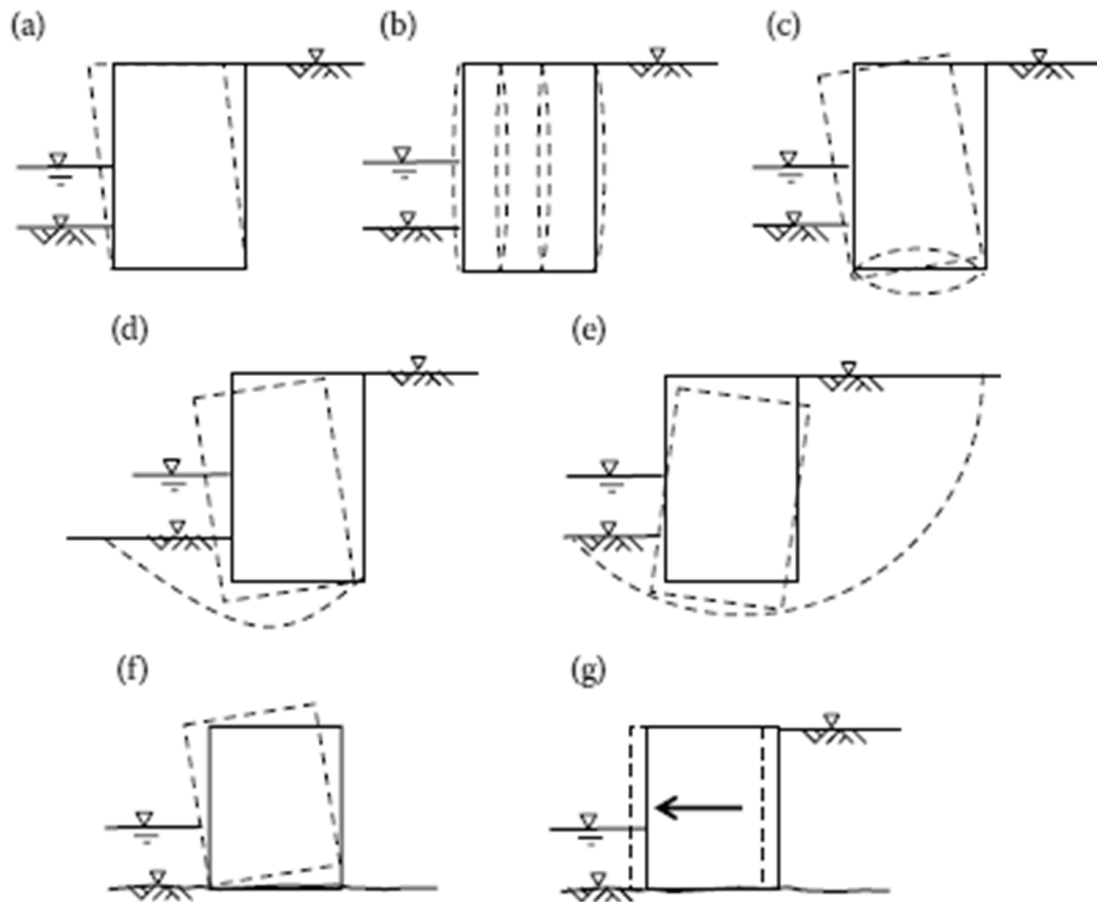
Cofferdam modes of failure. (a) Shear failure within the fill, (b) Sheet interlock failure, (c) Tilting on base rupture surface, (d) Bearing capacity failure, (e) Global stability, (f) Rotation about the toe, (g) Sliding on the base. After (Clayton et al. 2014).
